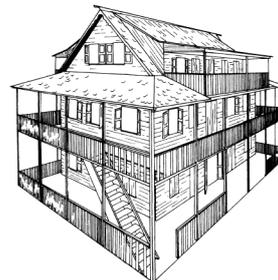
Fully expanded shed-roof house with MF2, MB2, and ML2-S expansions. Note typical stairway location (stairway to second floor may be located on front piazza).
